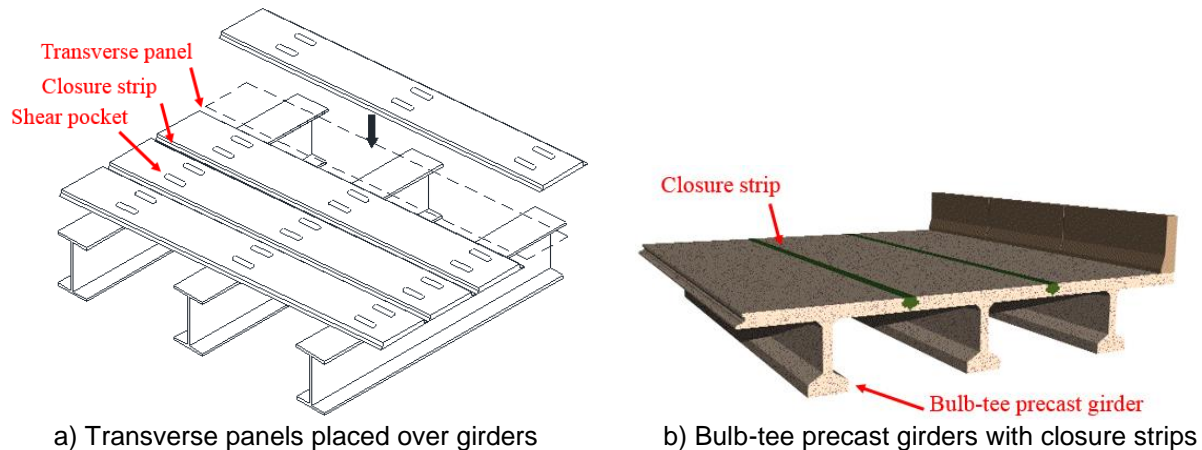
Views of two types of prefabricated bridge systems to accelerate bridge construction
